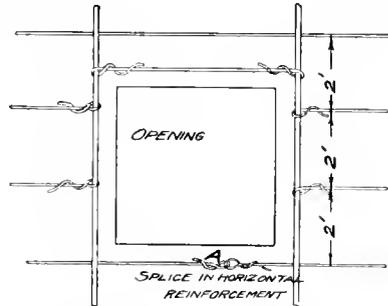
It is very essential that the reinforcement about the doorway is properly connected. Note how splices are made at A.
